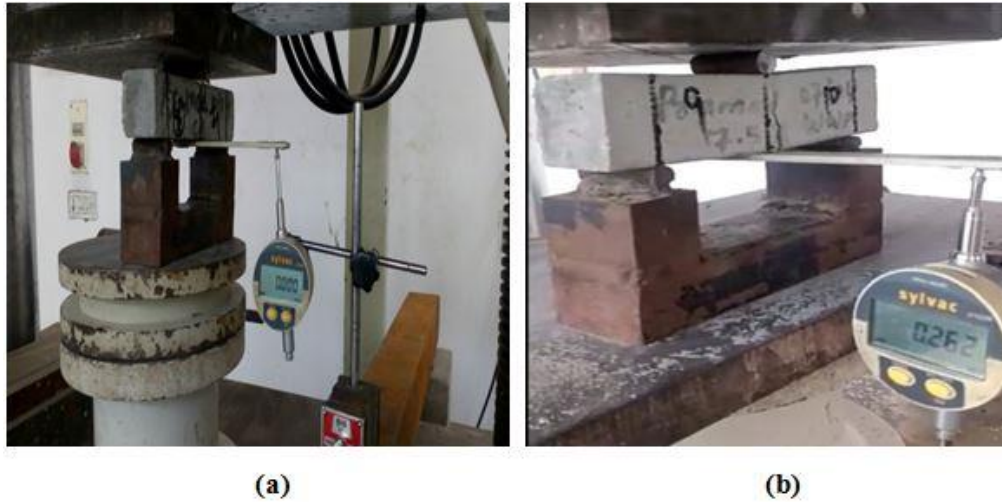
17: (a) Loading Arrangement of Flexure Test with Dial Gauge (b) Flexure Failure in Beam
